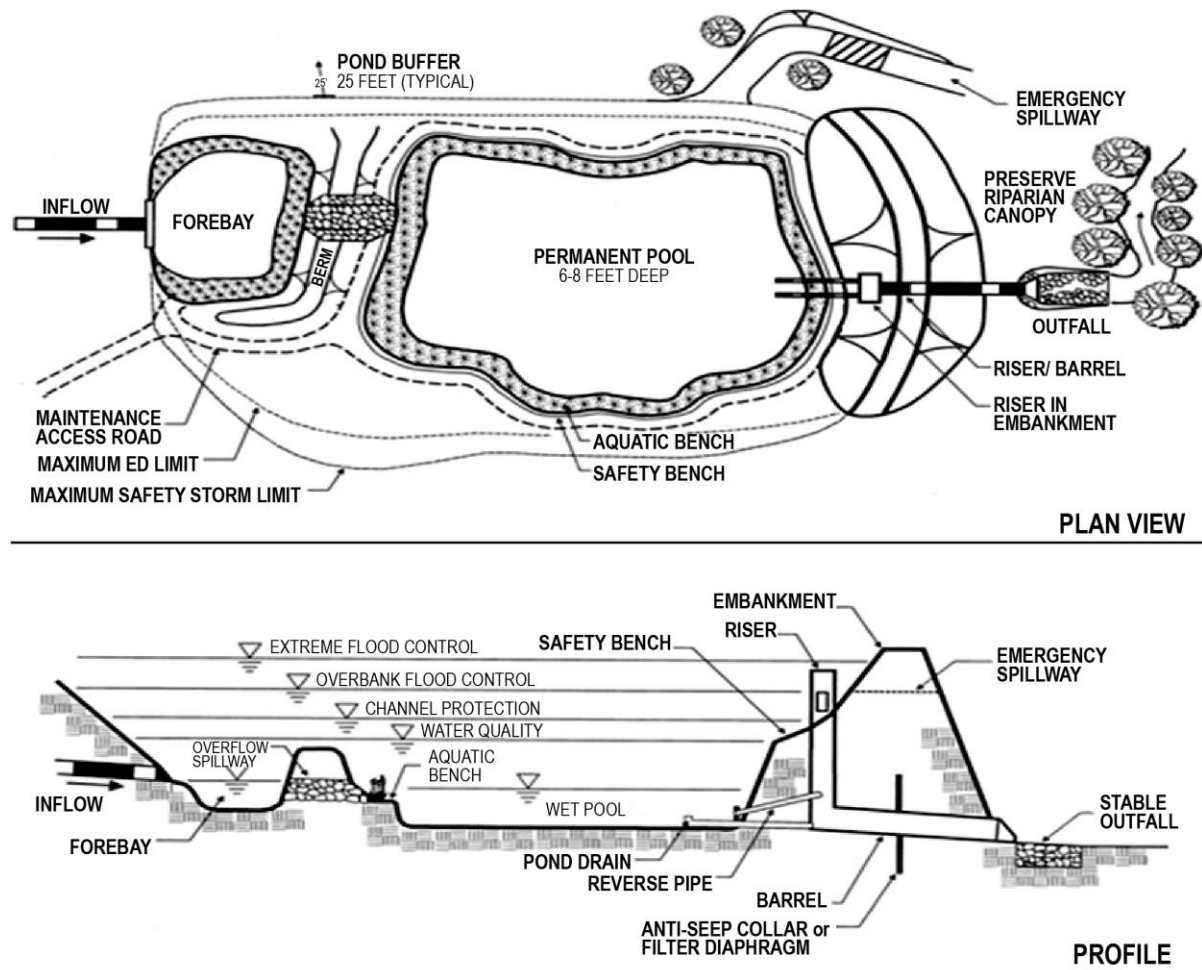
Plan view and profile of a wet extended detention pond (MPCA 2023).
